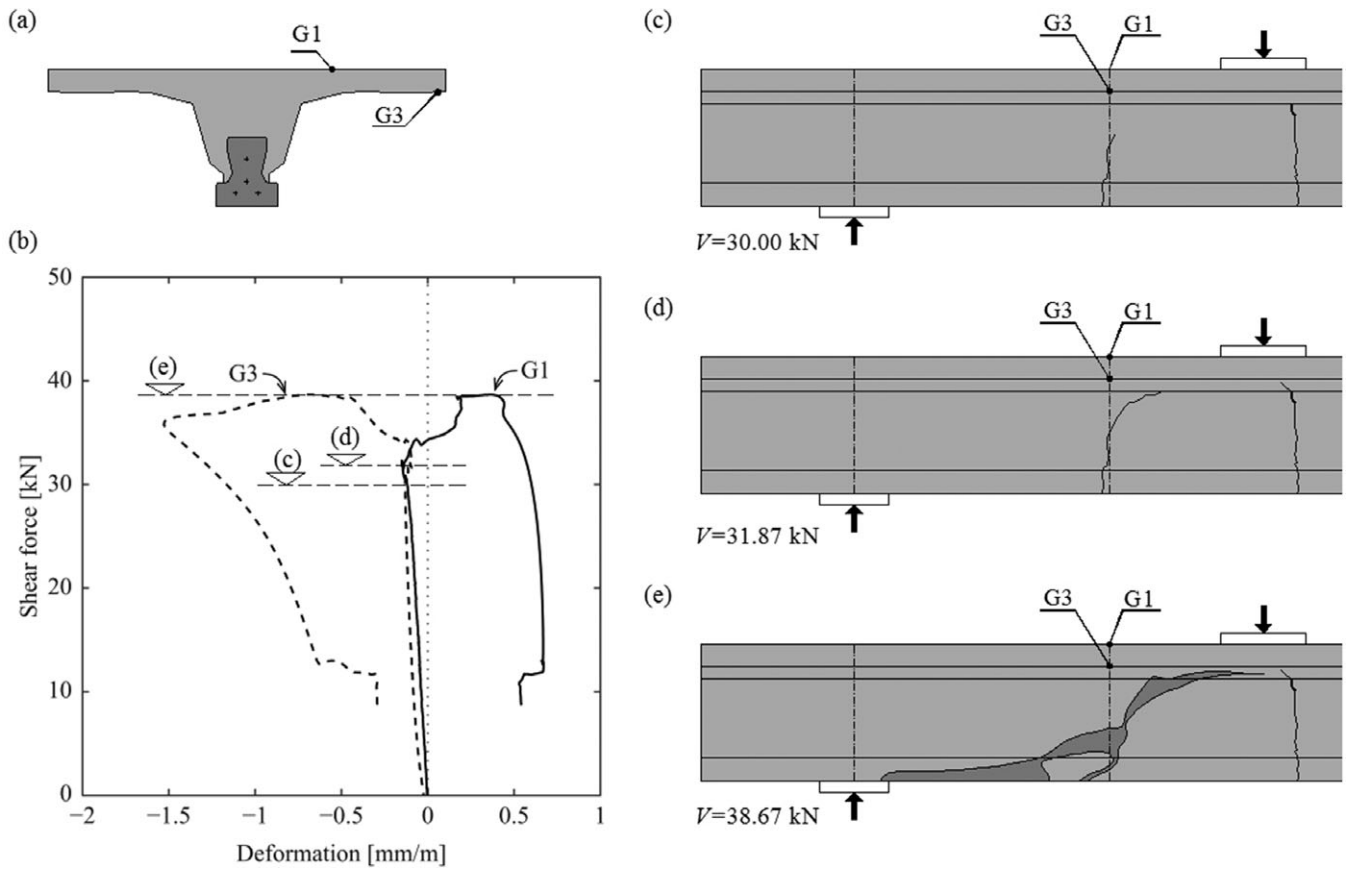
Strain measurements of a flange during a test:⁴ (a) specimen instrumentation at the cross section, (b) gauges measurements, (c) bending-induced cracking, (d) crack rotation, and (e) cracking pattern at maximum load.
